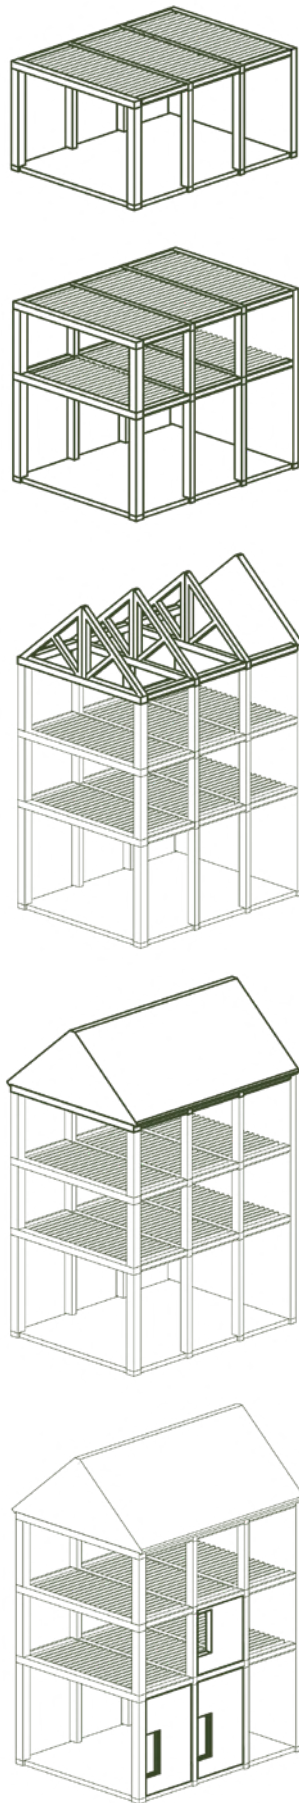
Diagram of the constructive system and structure of a timber building. By author.
